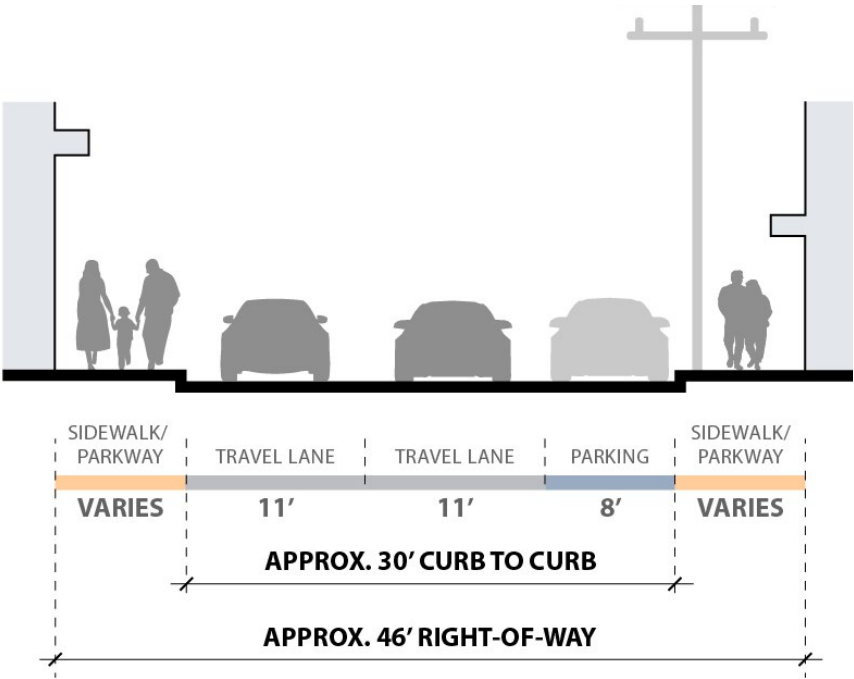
EXISTING STREET CONDITION: OLIVE STREET (LOOKING EAST)
